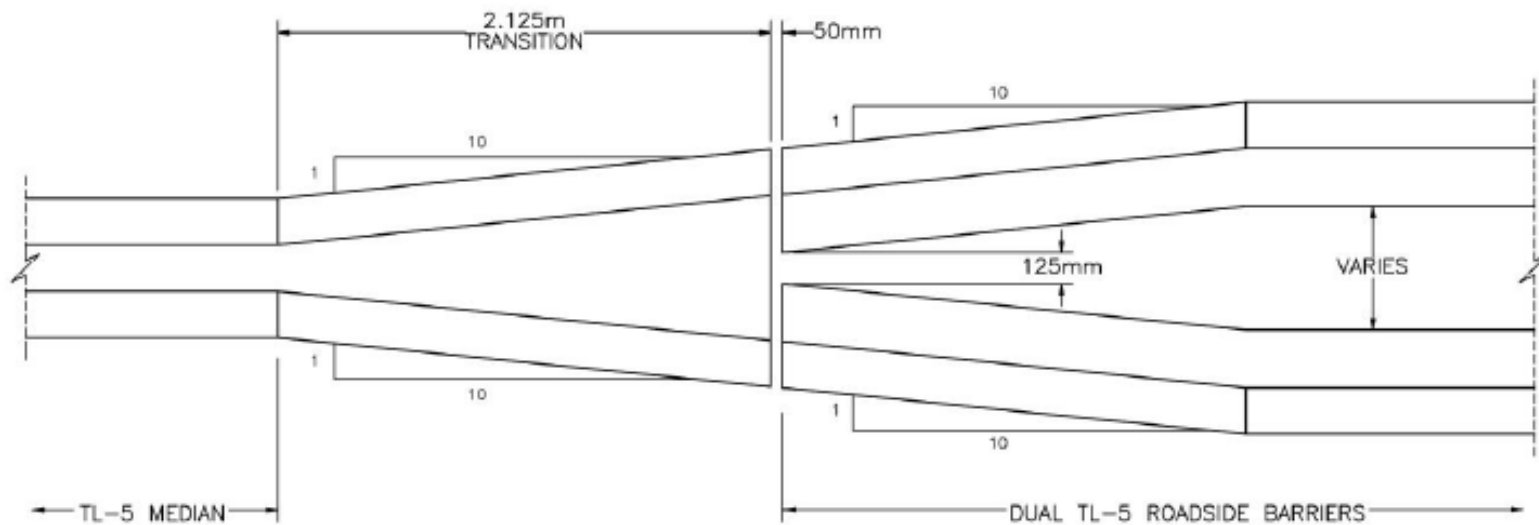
Plan View of MASH TL-5 Transition Details showing Lateral Flare Rates
